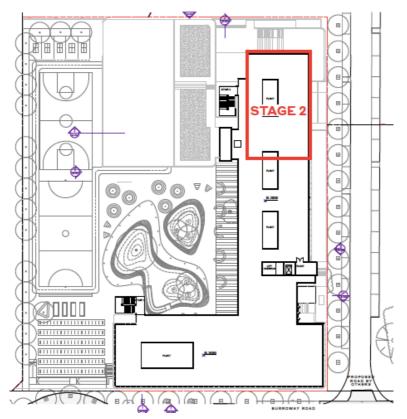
Staging plan – Roof Source: Wood Bagot
